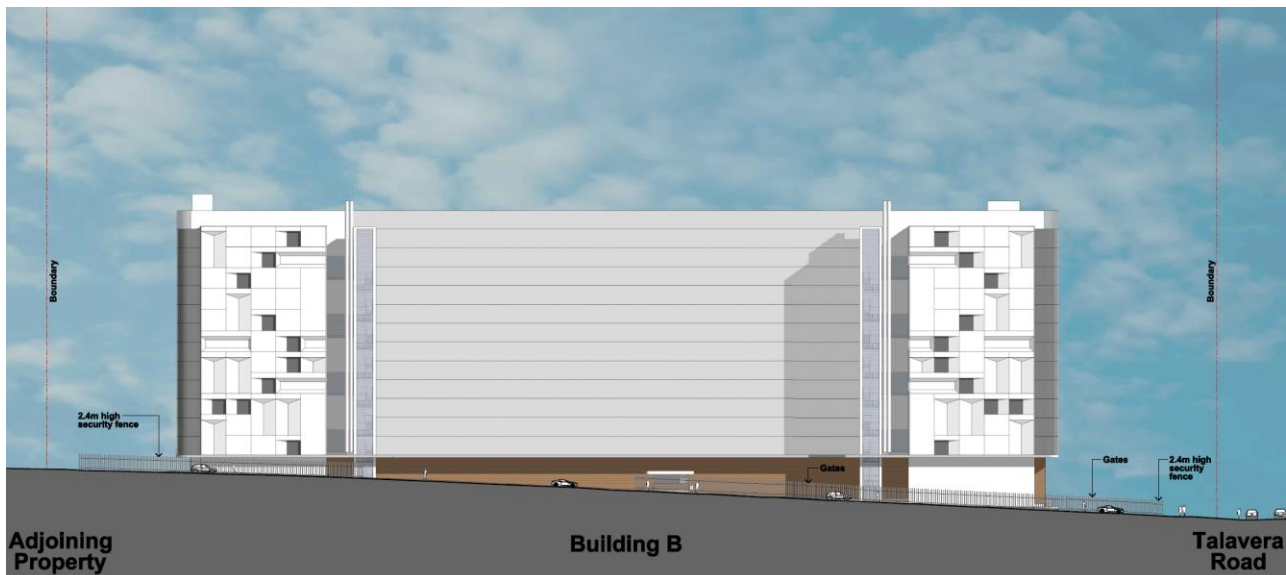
South East Elevation Plan (facing Road 22) of proposed Buildings B data centre (Source: Stockland Dwg No. Data_Elev21 SK7A dated 01.10.20)
